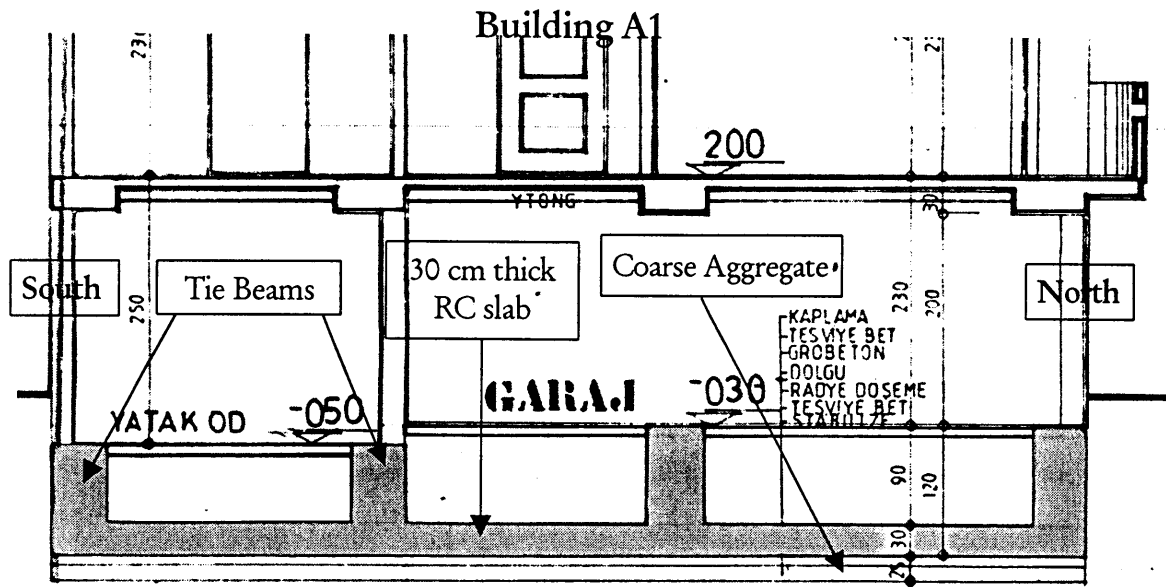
North-south cross section across the foundation and ground floor of building A1.
